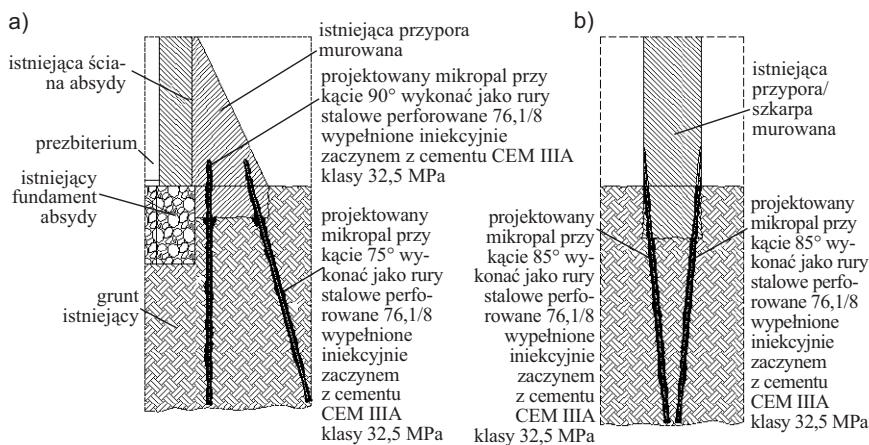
Buttress foundation reinforcement: a) longitudinal section, b) cross-section
